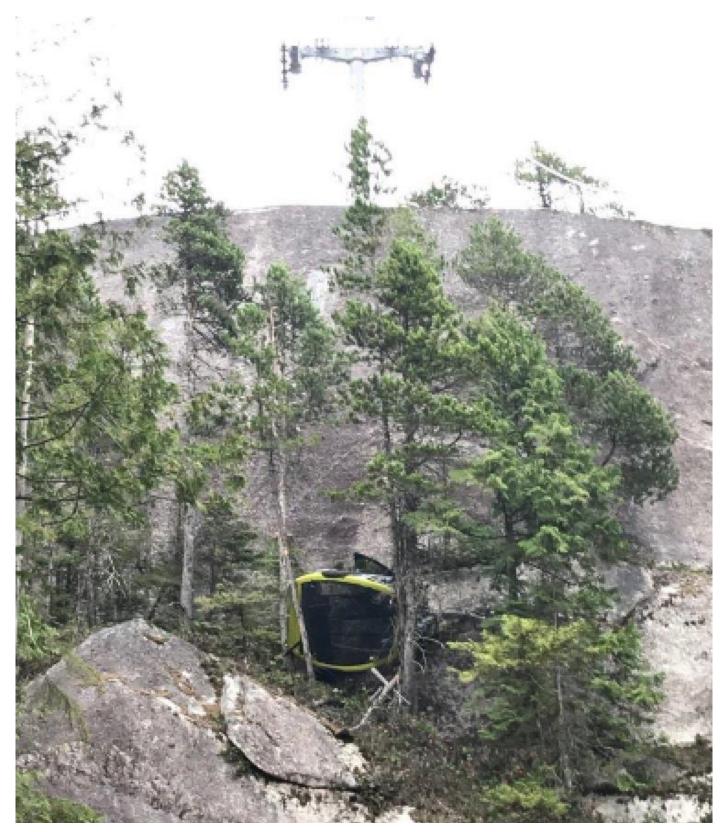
View looking uphill at tower. Damage and debris indicates gondola cabin likely struck tower/rock face after separation and haul rope was pulled out of cabin grip and past tower.
